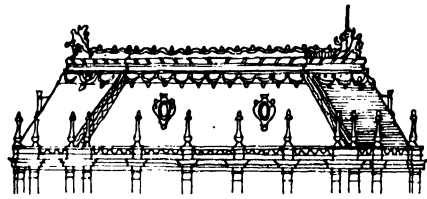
ROOF OVER THE CHAPEL, VERSAILLES
